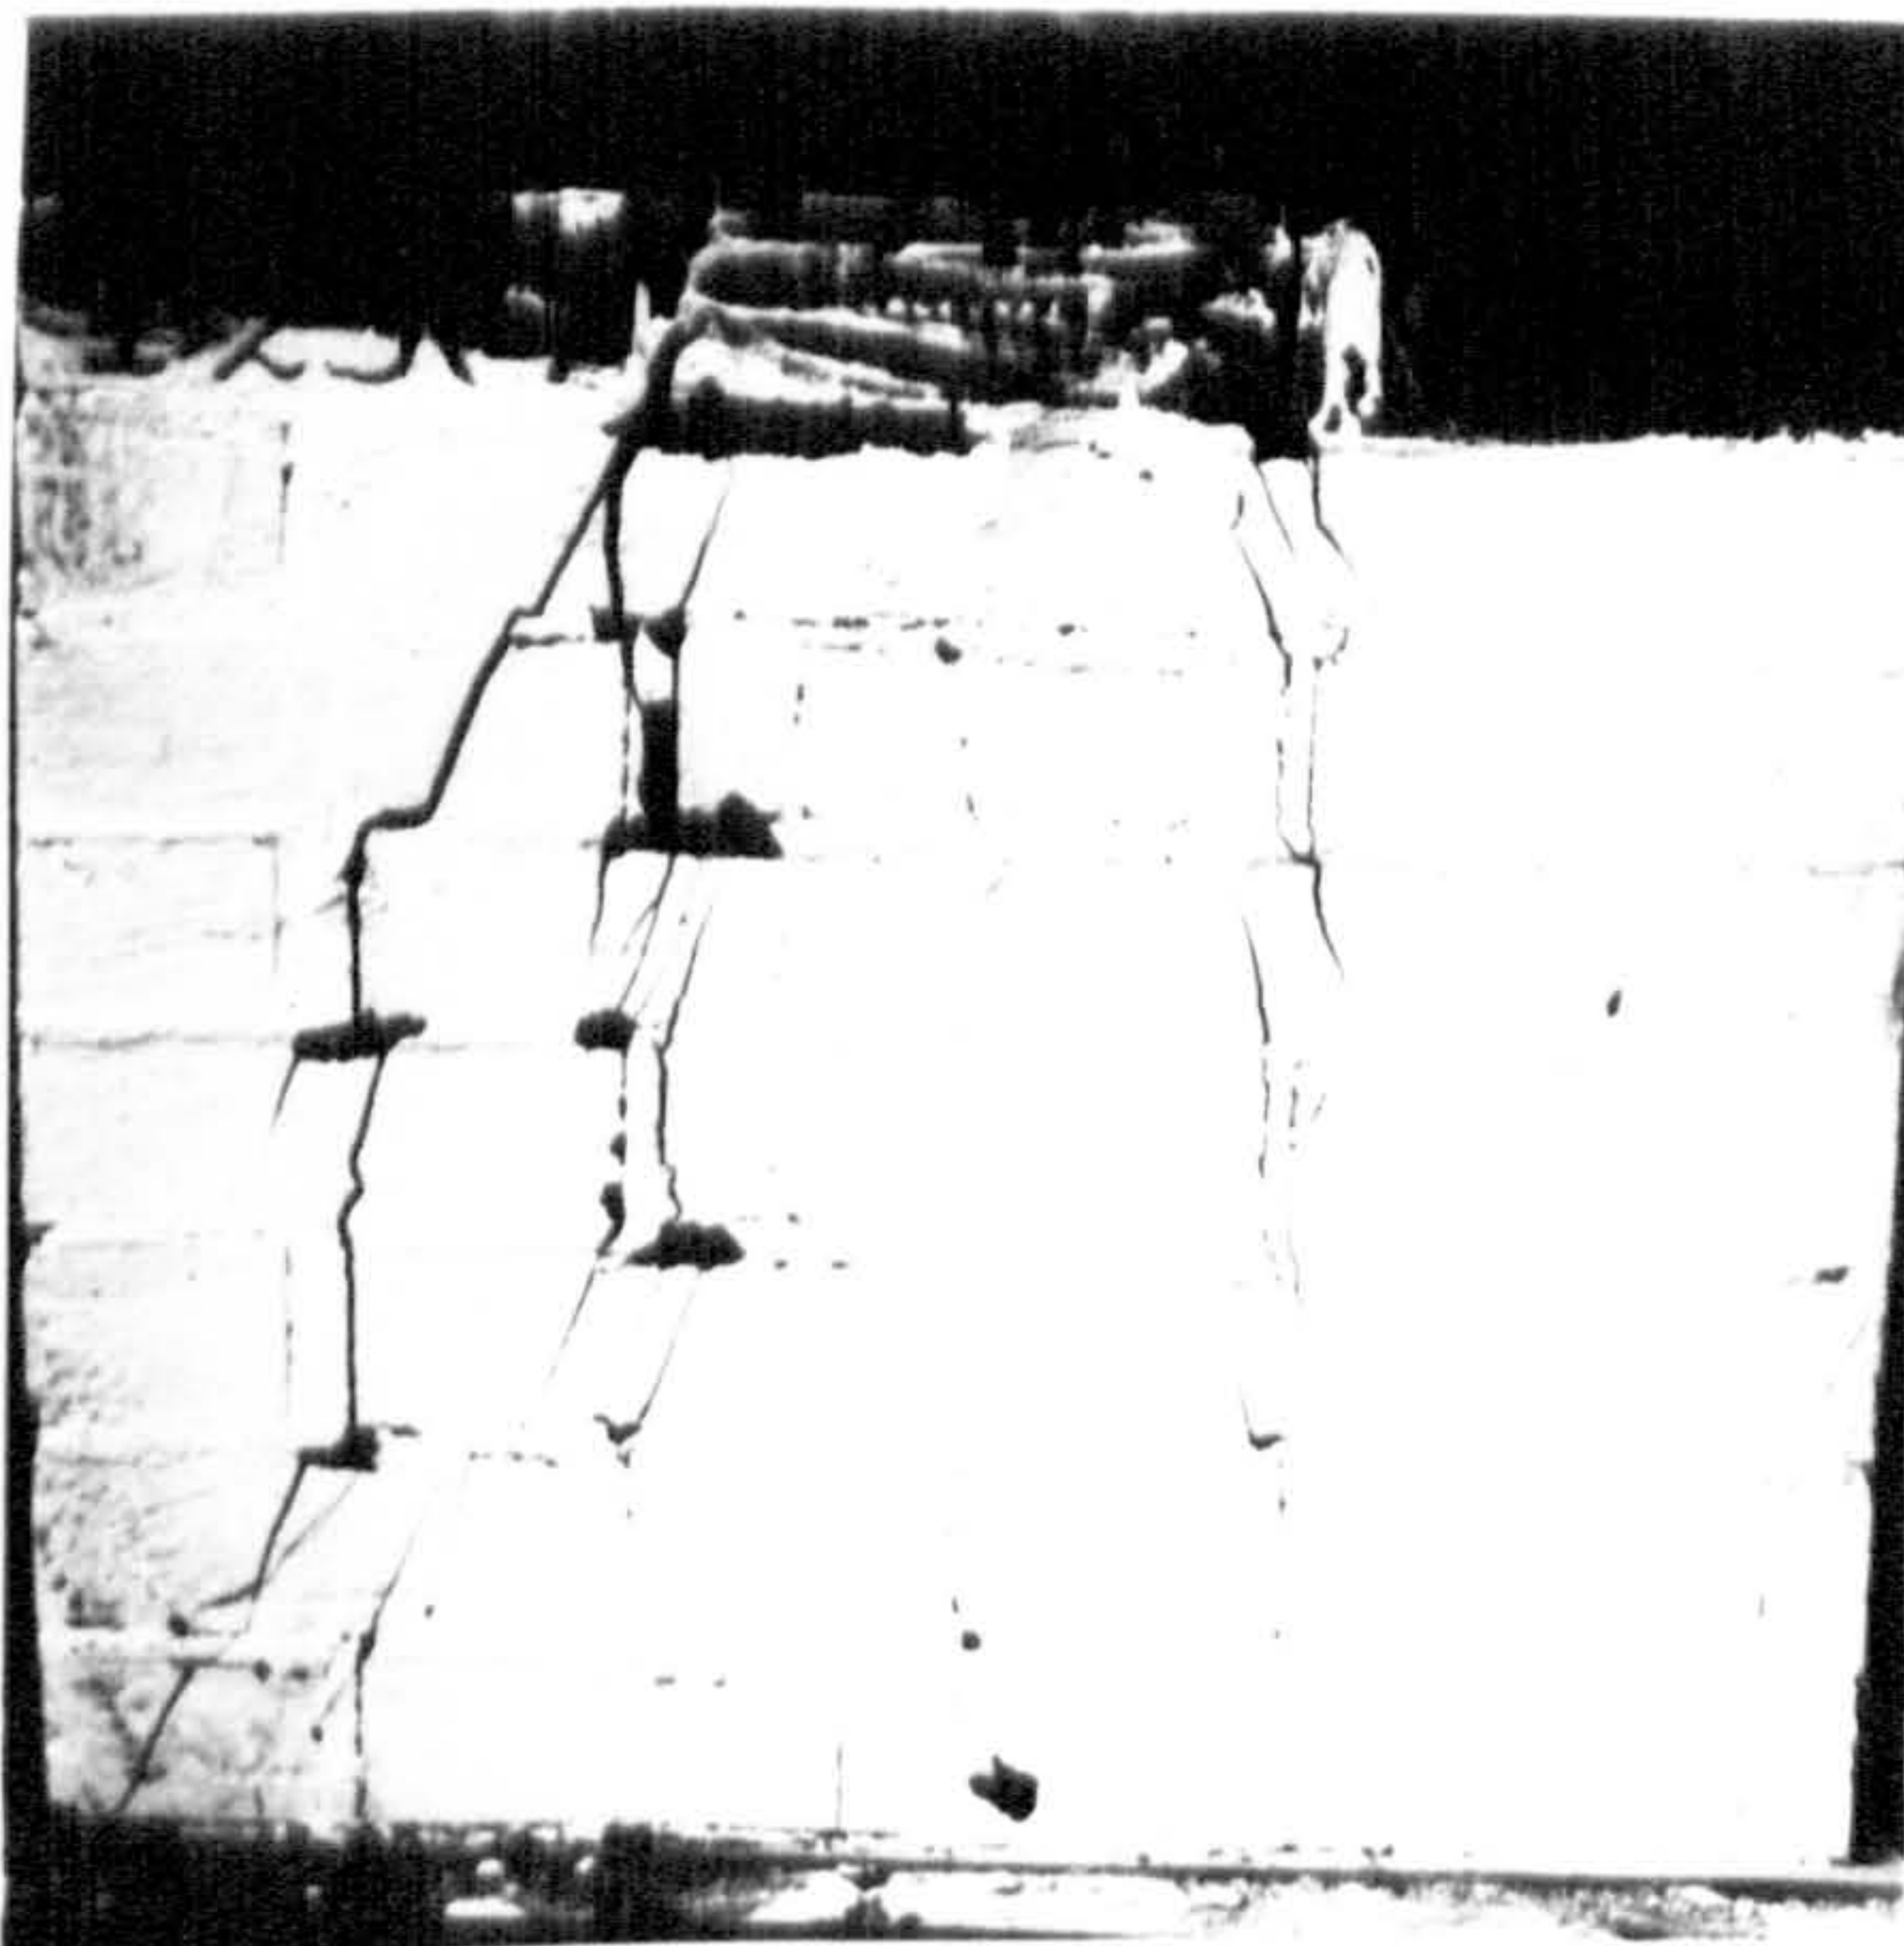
Typical failure mode and crack pattern for brickwork type A under central strip loading ( $t=10.5\text{mm}$ ).
